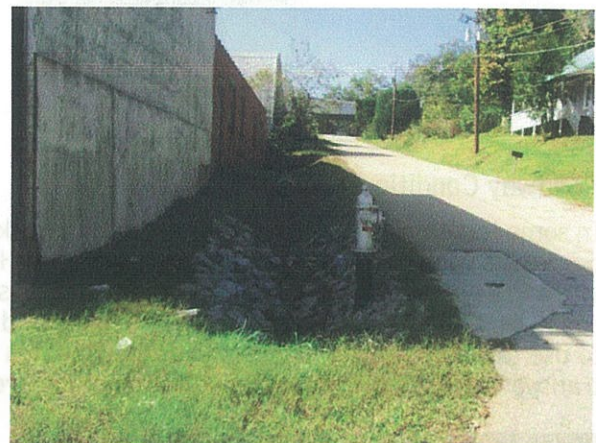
Pine Street, looking Northwest. Dangerous ditches very close to the edge of the pavement.
